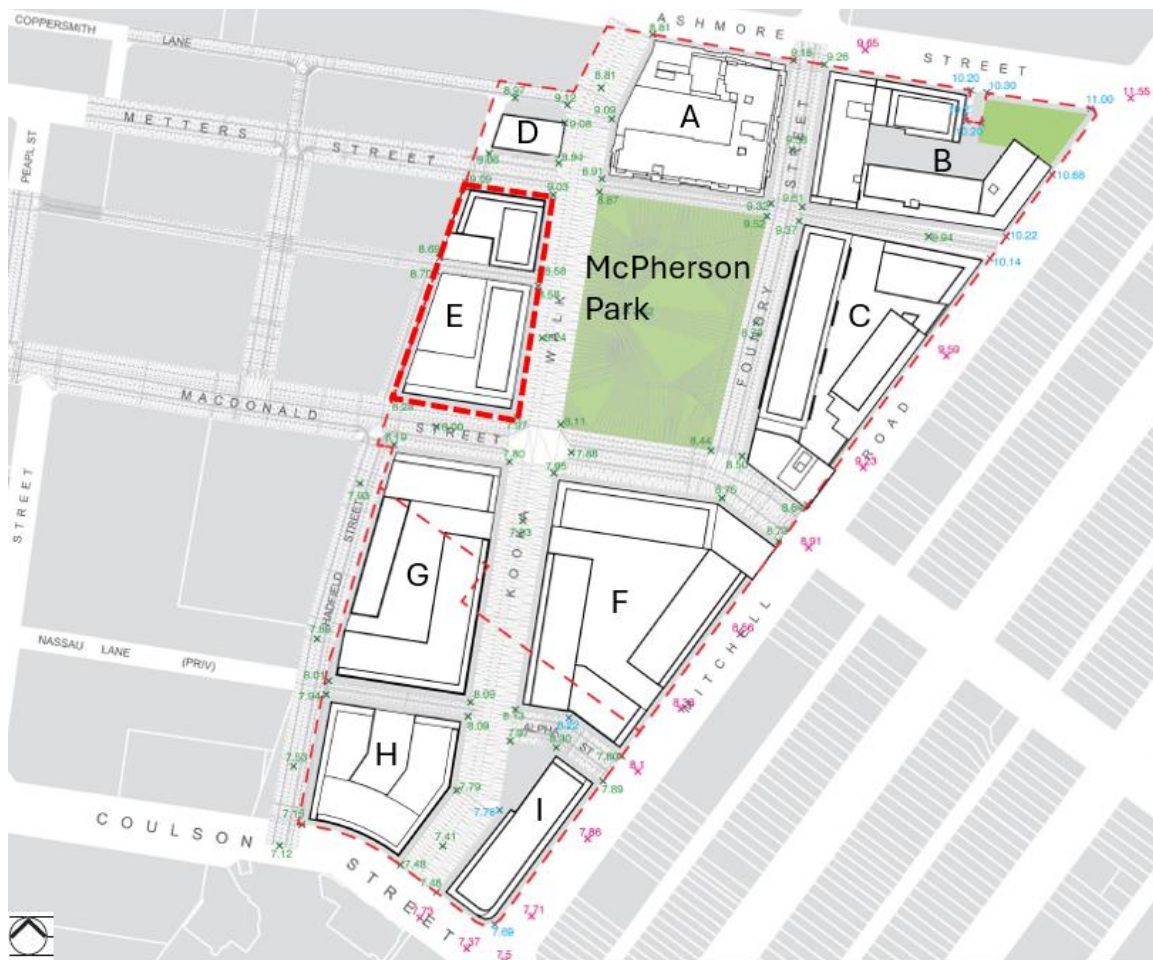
Site plan depicting building envelopes of Blocks A-I (from D/2015/966/C)
